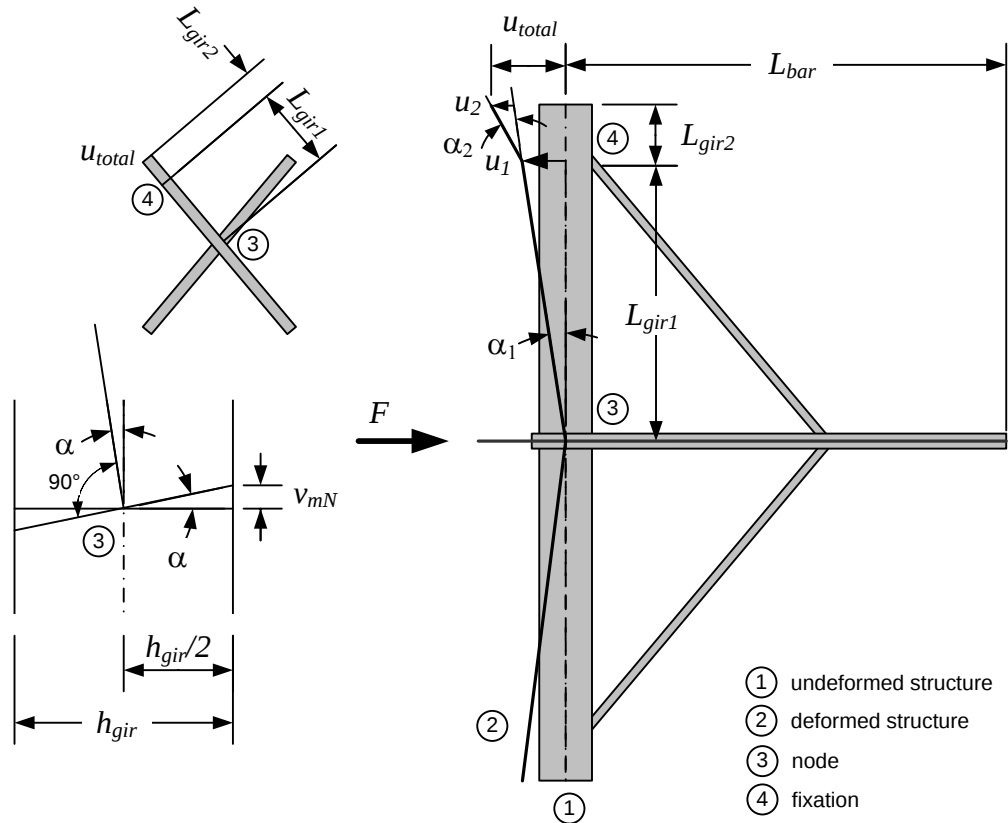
Determination of maximal deformation – Installation setup 1 and installation setup 2
